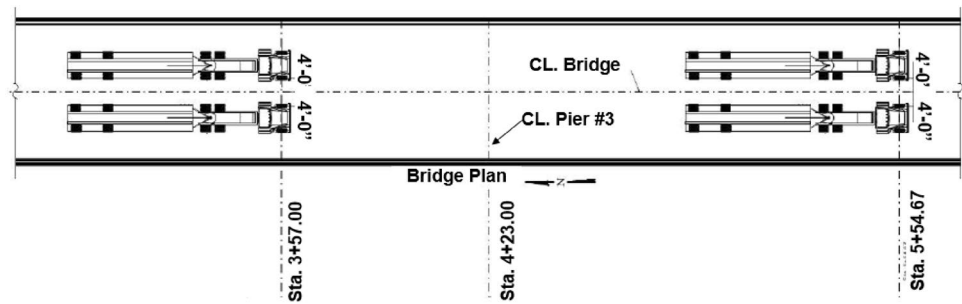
Elevation view of the bridge for the maximum negative moment at Pier #3
